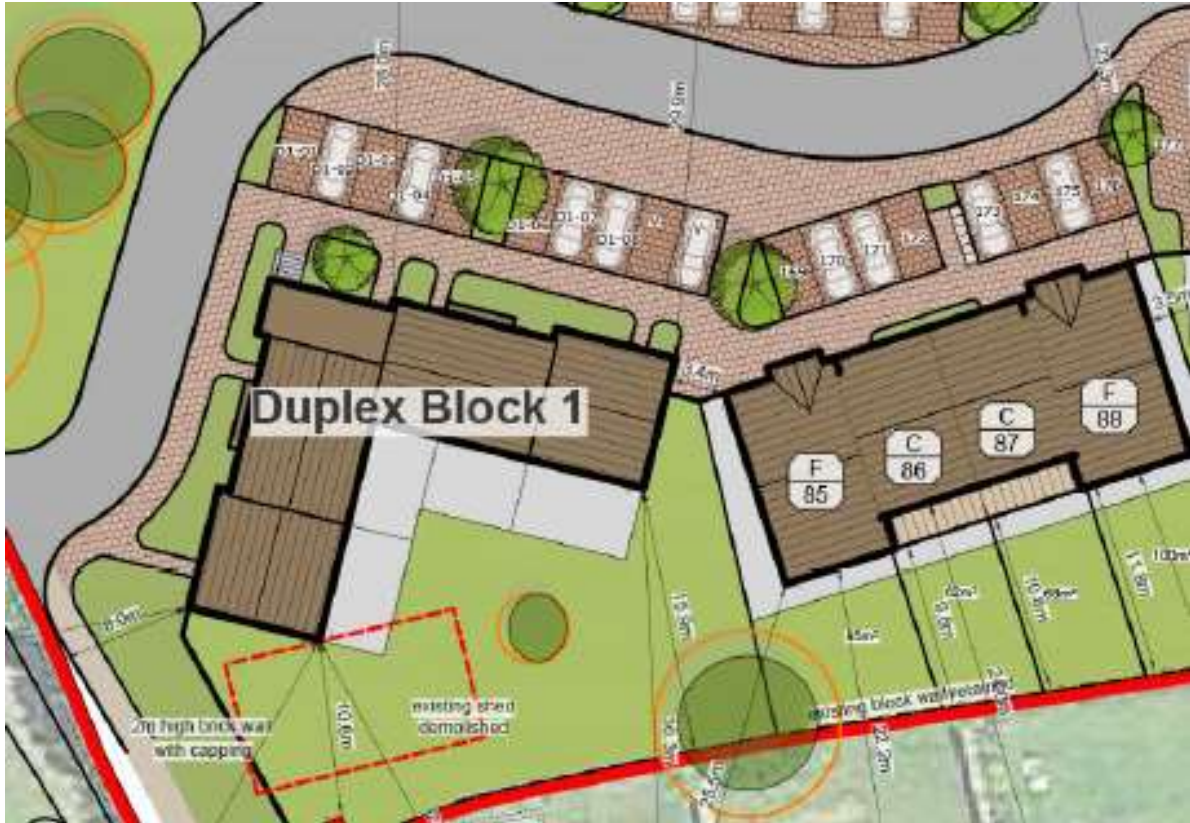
Proposed arrangement of Duplex Apartment Block 1
